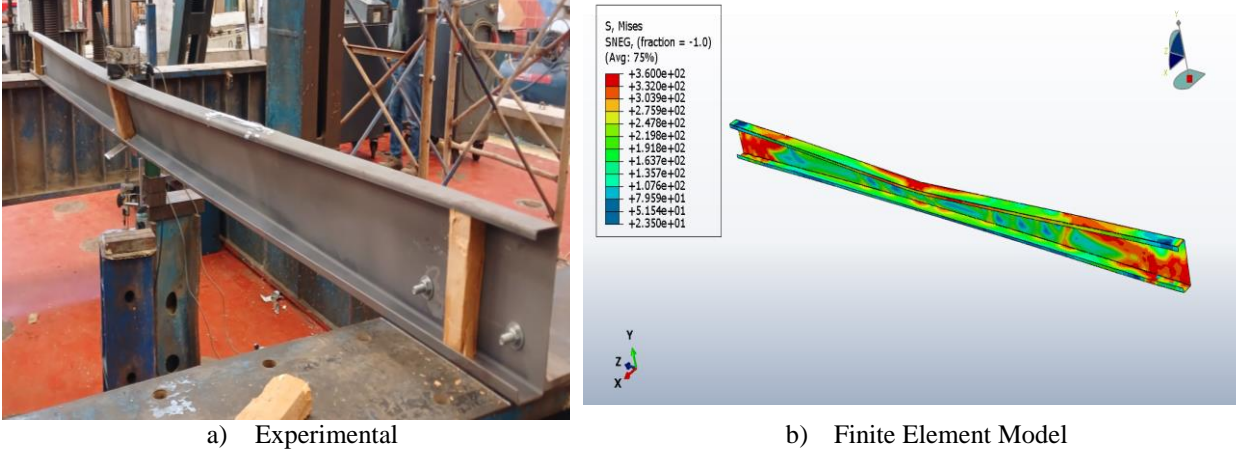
Failure modes of purlins without tie rods, specimen P-1, C-section, $t=1\text{mm}$.
